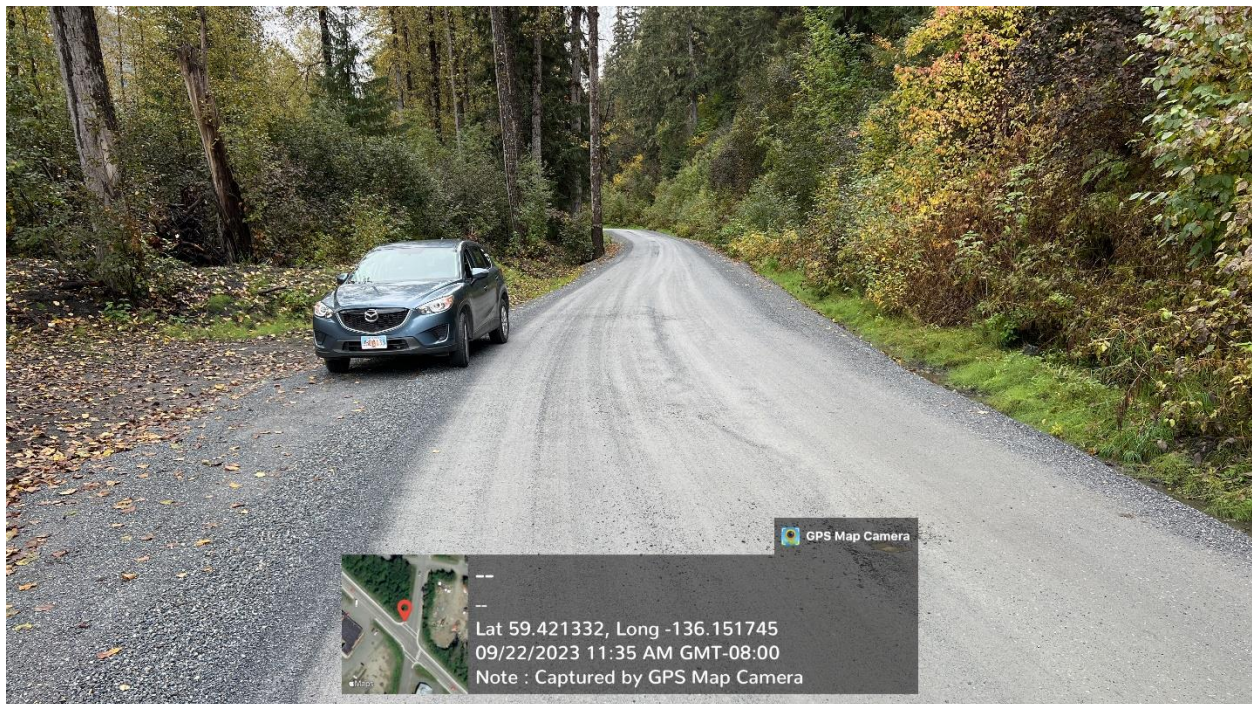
Porcupine Trail Road Phase I stop of work, photo facing beginning of road. Same location as Figure A.15.
